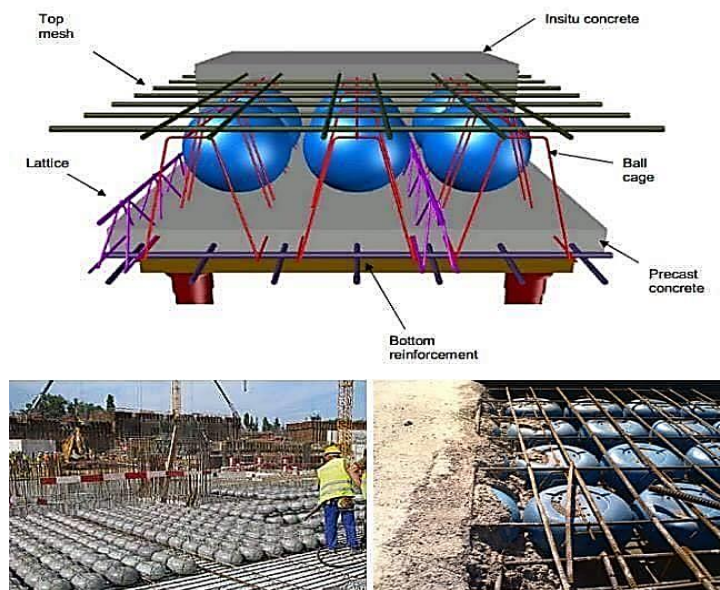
Placing Cubiax balls on the slab and filling with concrete
